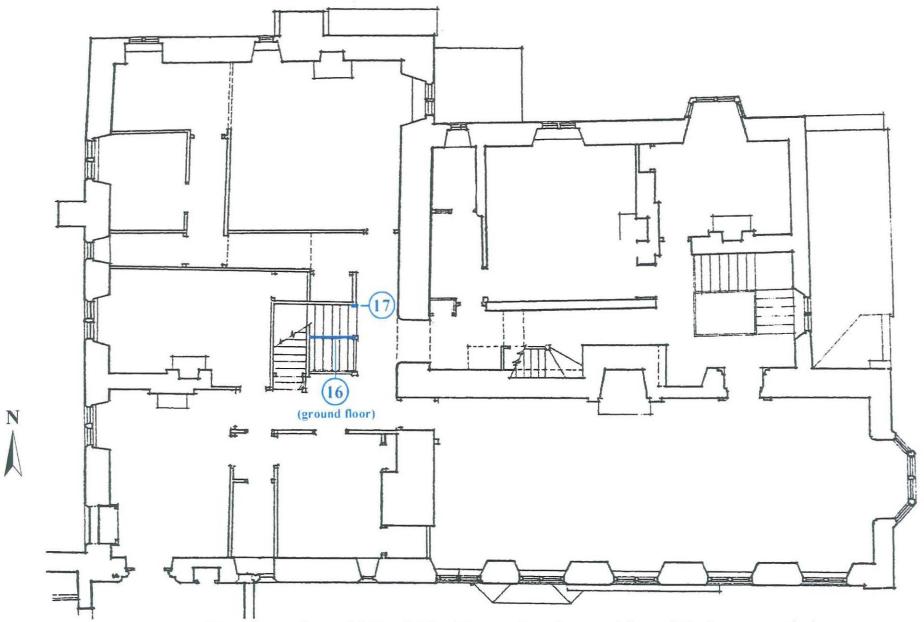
First floor plan of Abbot's Residence showing position of timbers sampled
